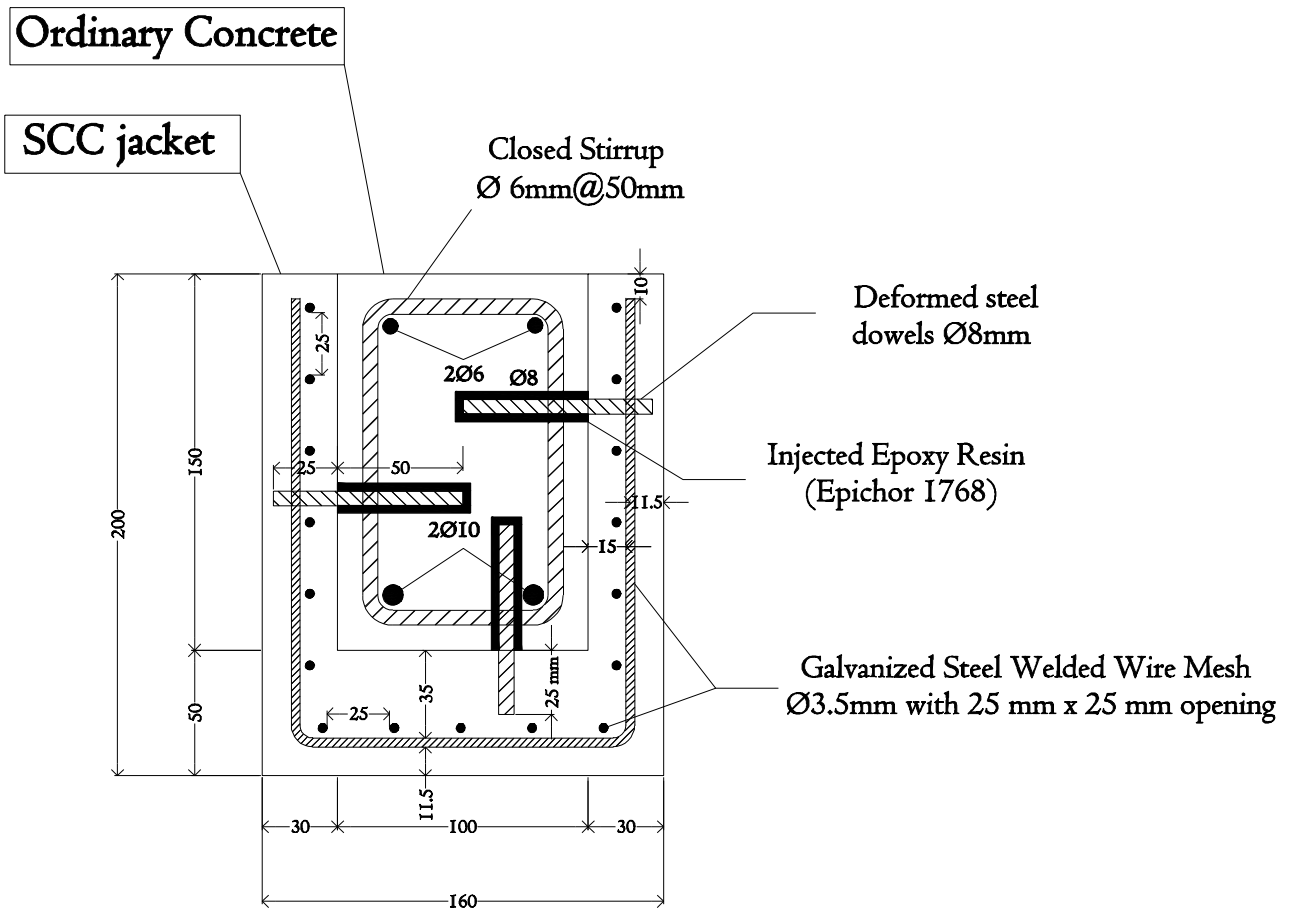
Strengthened beams GA.B3 and GA.B4 cross section (mm).
